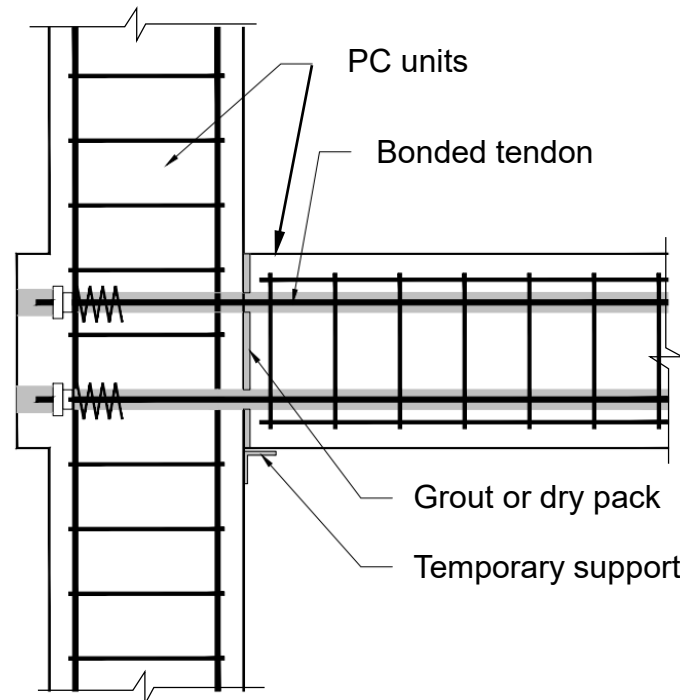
SYSTEM-1: PRECAST BEAM ELEMENTS POST-TENSIONED BETWEEN COLUMNS
